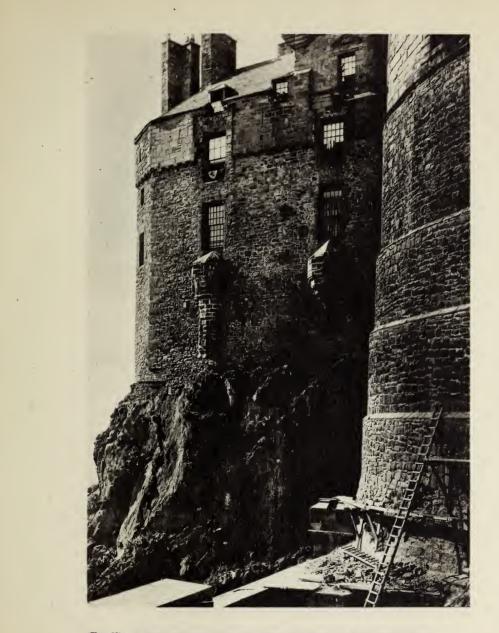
VIEW SHOWING N.W. END OF HALF-MOON BATTERY WALL, WITH THE SECTION REPAIRED AFTER COLLAPSE IN 1638, AND THE OLDER MASONRY ADJOINING
